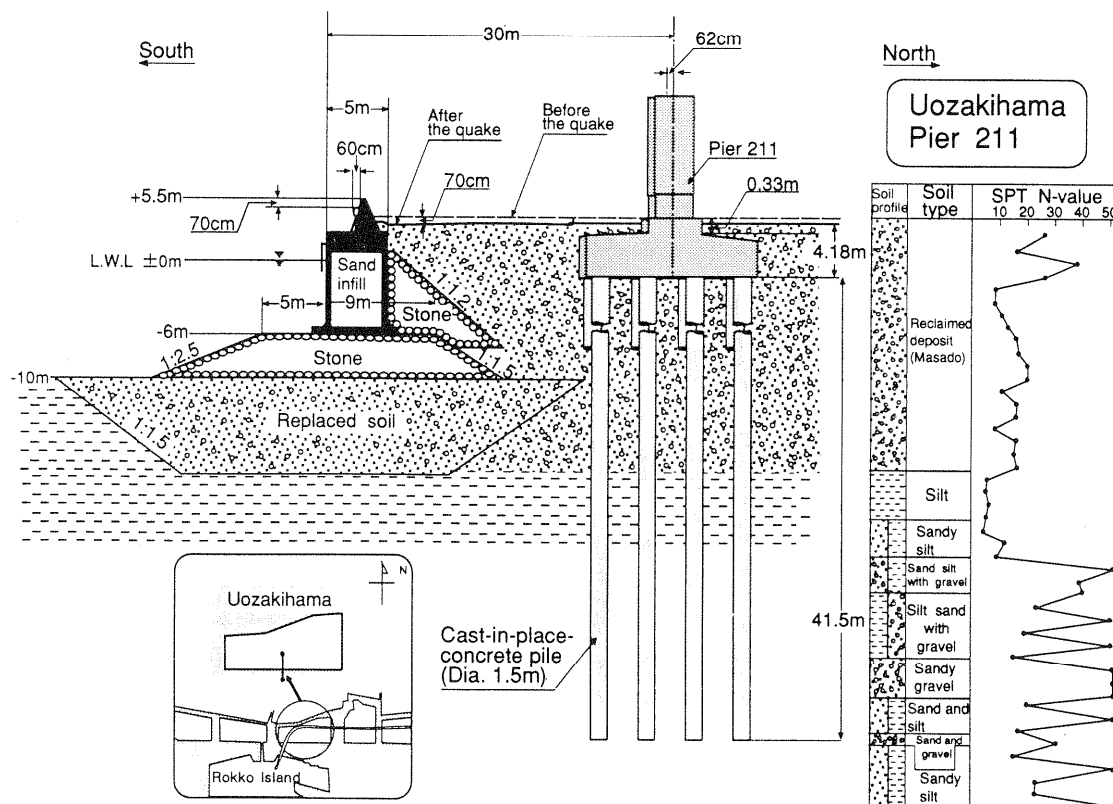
Quay wall, foundation and soil conditions at Pier 211 (Hanshin Highway Authority, 1996)
